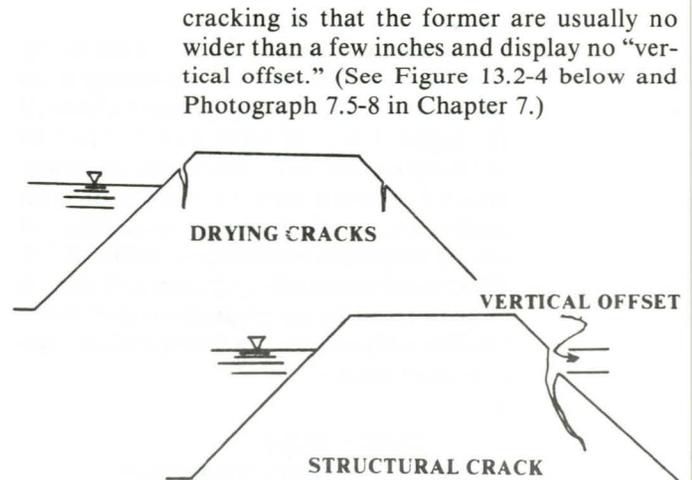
DRYING V.S. STRUCTURAL CRACK
